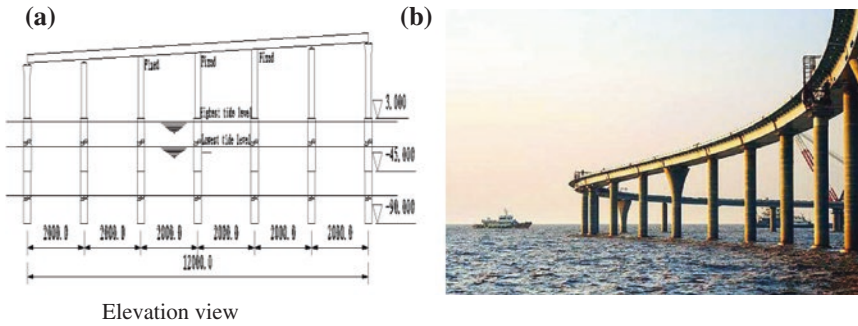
The ramp bridges with single column pier of single pile, a elevation view, b side view photo
